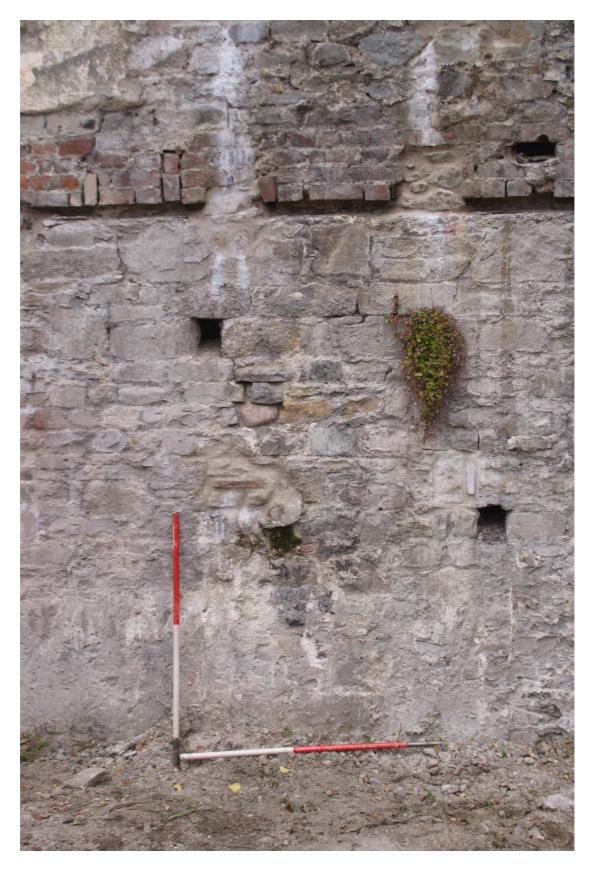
Lower section of retaining wall with putlogs visible shot 5.
